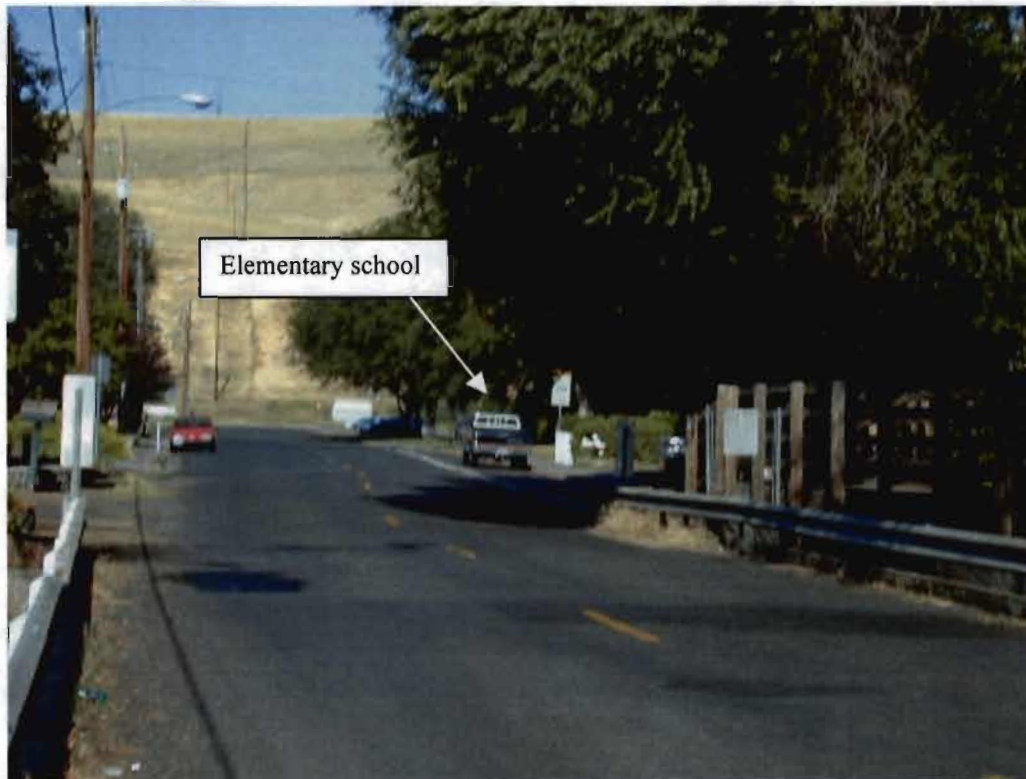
View looks west at Quinney Ave. from McKay Creek bridge.
